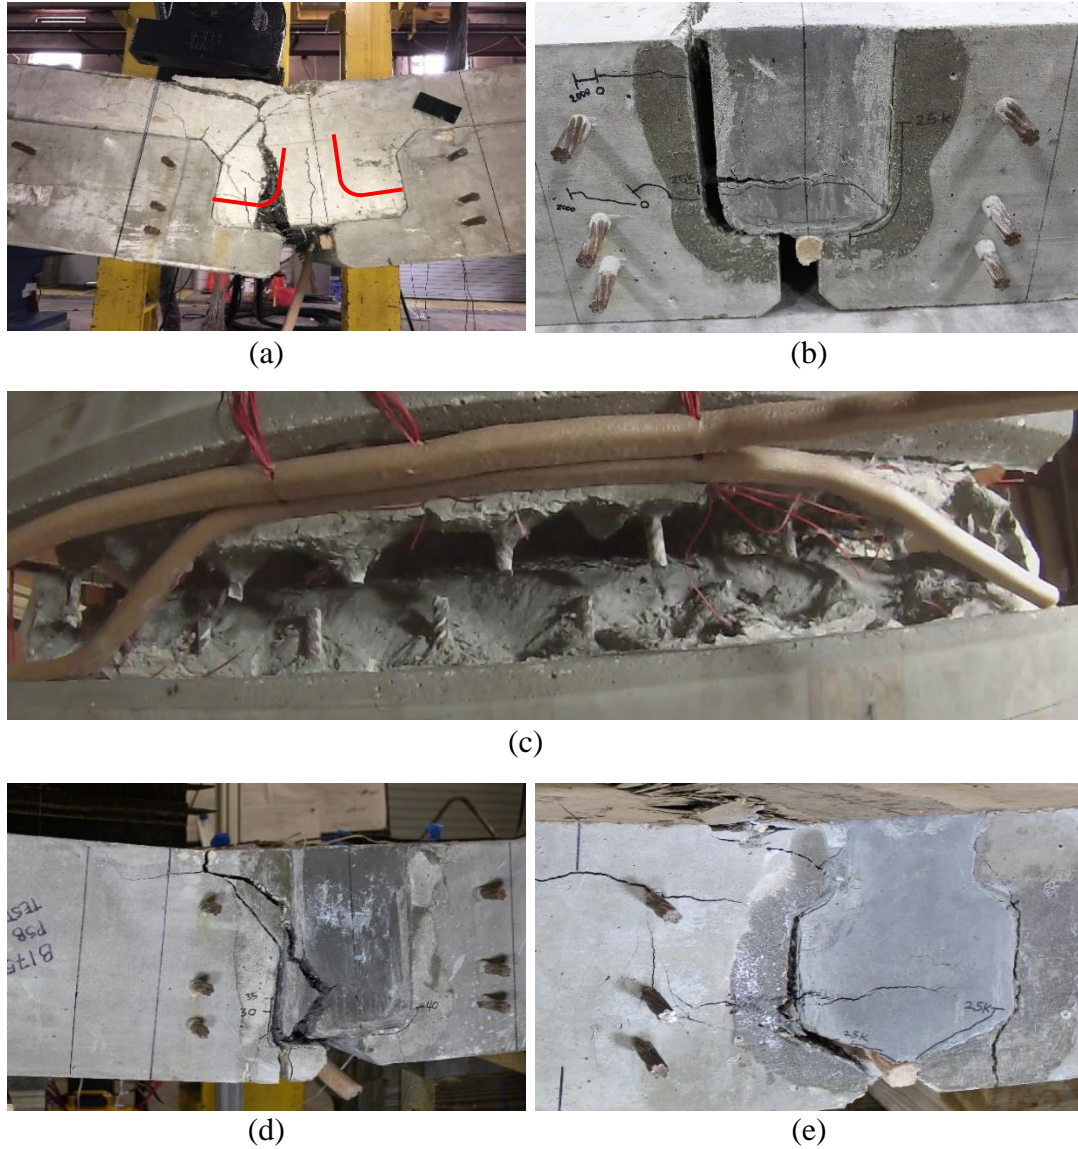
Failure mechanism observed during testing: (a) pullout of hooked reinforcement in FSB-1 (hooked joint reinforcement shown), (b) pullout of straight joint reinforcement caused by splitting crack in 12F1-1 (splitting crack shown after unloading), (c) pullout of straight joint reinforcement in 18F1-1 (bottom view shown), (d) pullout of straight joint reinforcement with conical failure in 12F2-2, and (e) crushing of concrete in top of section in 12A2-1
